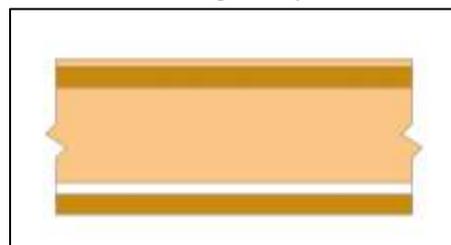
side view of the installation of 12.5 mm (1/2 in.) regular gypsum board flange-to-flange of I-joist
